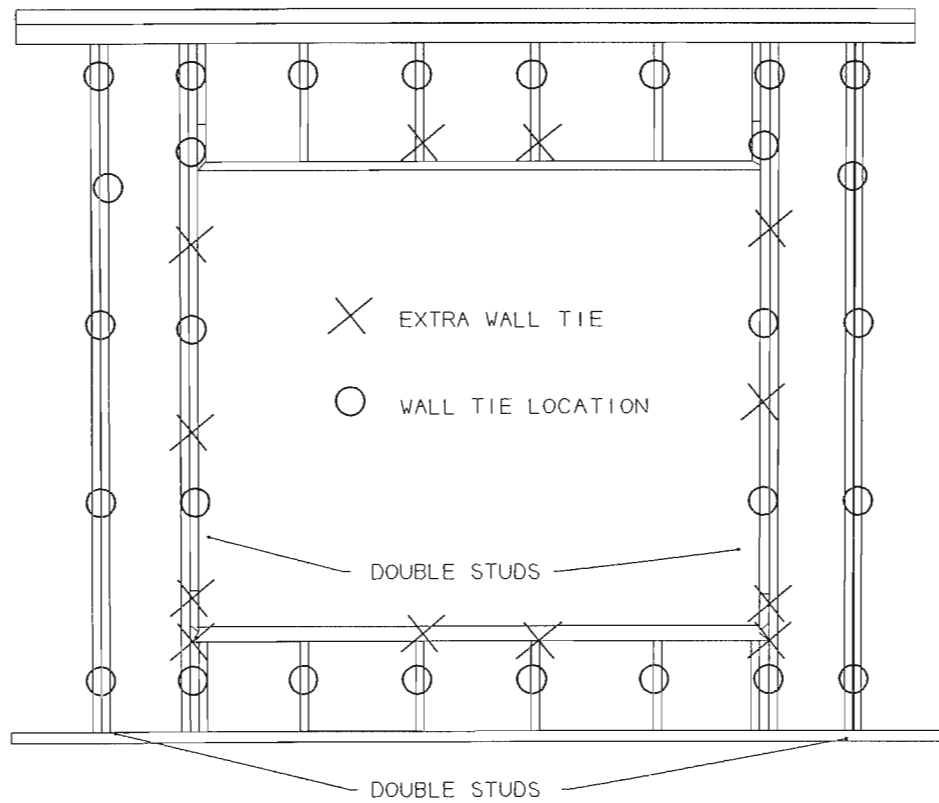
ARRANGEMENT OF WALL TIES AROUND WINDOW
